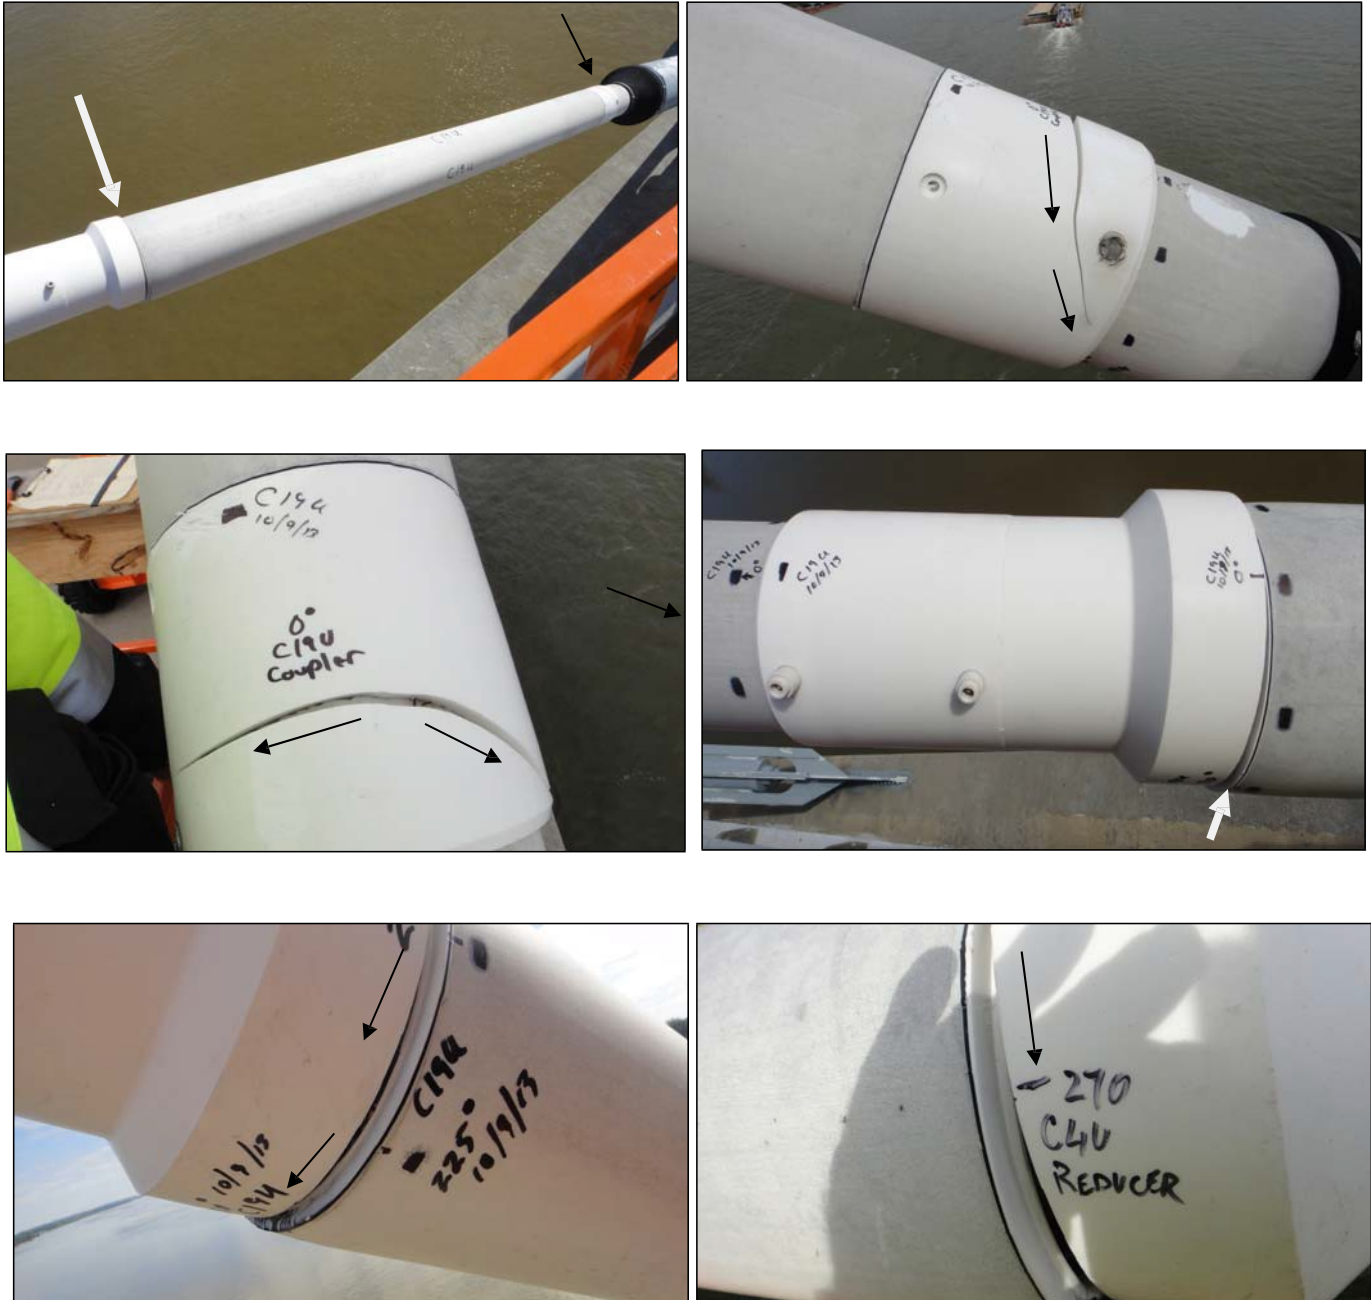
C19U: Bottom Coupler Crack in Middle of Specimen and Reducer Crack at Butt Weld to the Larger Diameter Pipe
